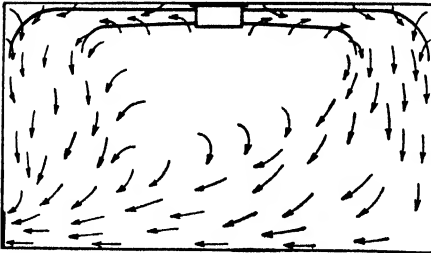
Elevation. Air distribution with ceiling outlets in center of room and returns at floor.
